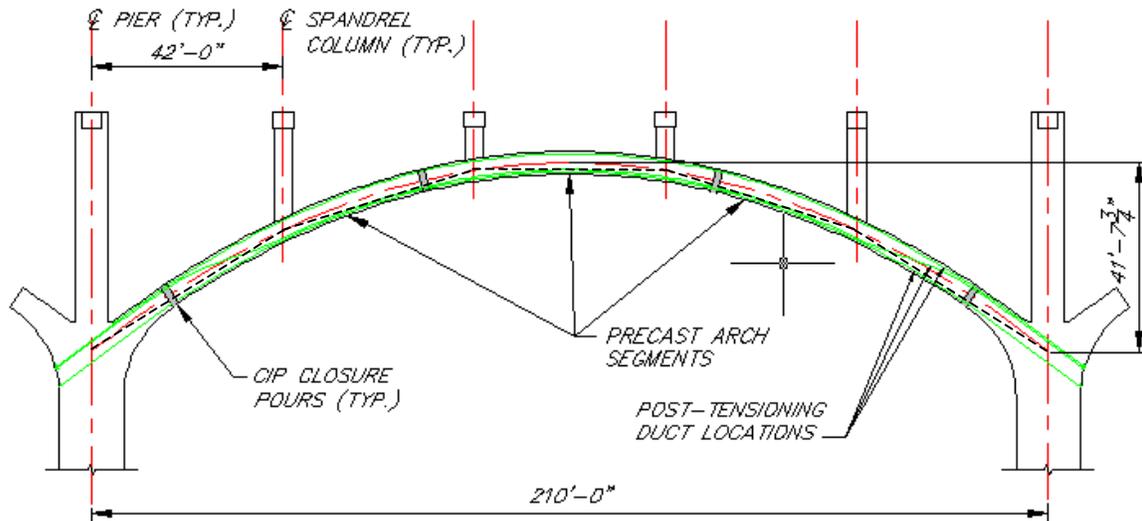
Typical arch geometry and segment layout for the new Fulton Road Bridge. The line of thrust for the dead loads of the structure is shown superimposed on the proposed arch with dashed lines.
